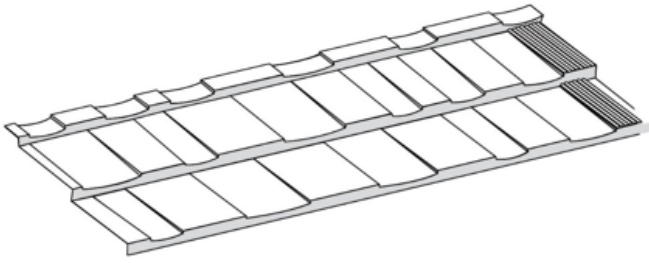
Unified Steel Stone Coated Roofing - COTTAGE Shingle panel
